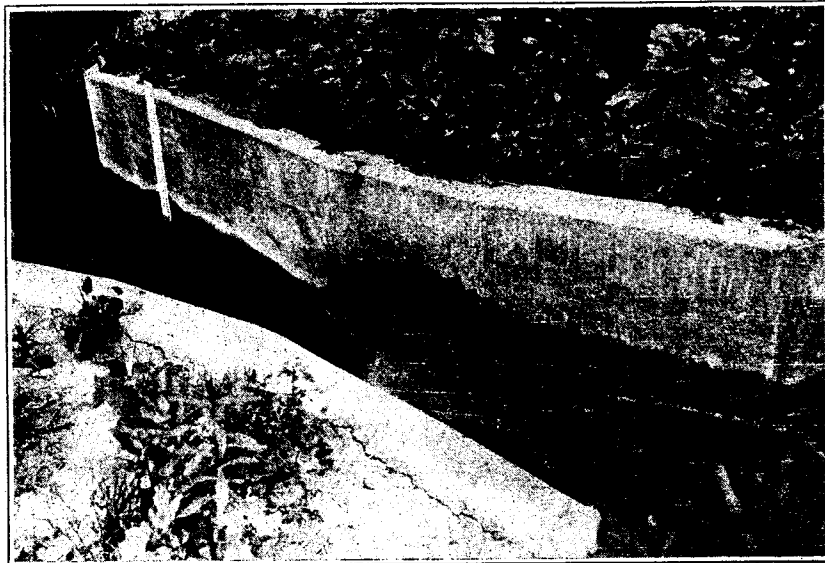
Three-foot reinforced concrete Parshall measuring flume discharging about 13 second-feet. Kern lateral, Lake Canal system, near Fort Collins, Colo.
